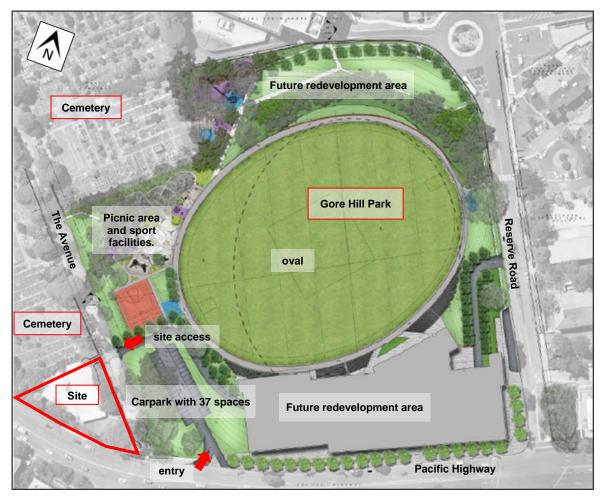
| GHP Concept Plan showing existing and proposed facilities (Source: Applicant's EIS)
